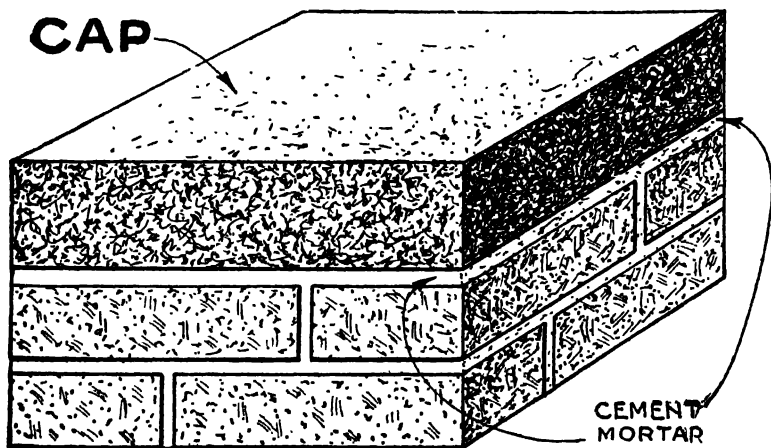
365 —Stone cap for 12×12 pier showing it bedded with cement mortar. Too much care cannot be given to making this joint perfect because on this depends the equal distribution of the load
